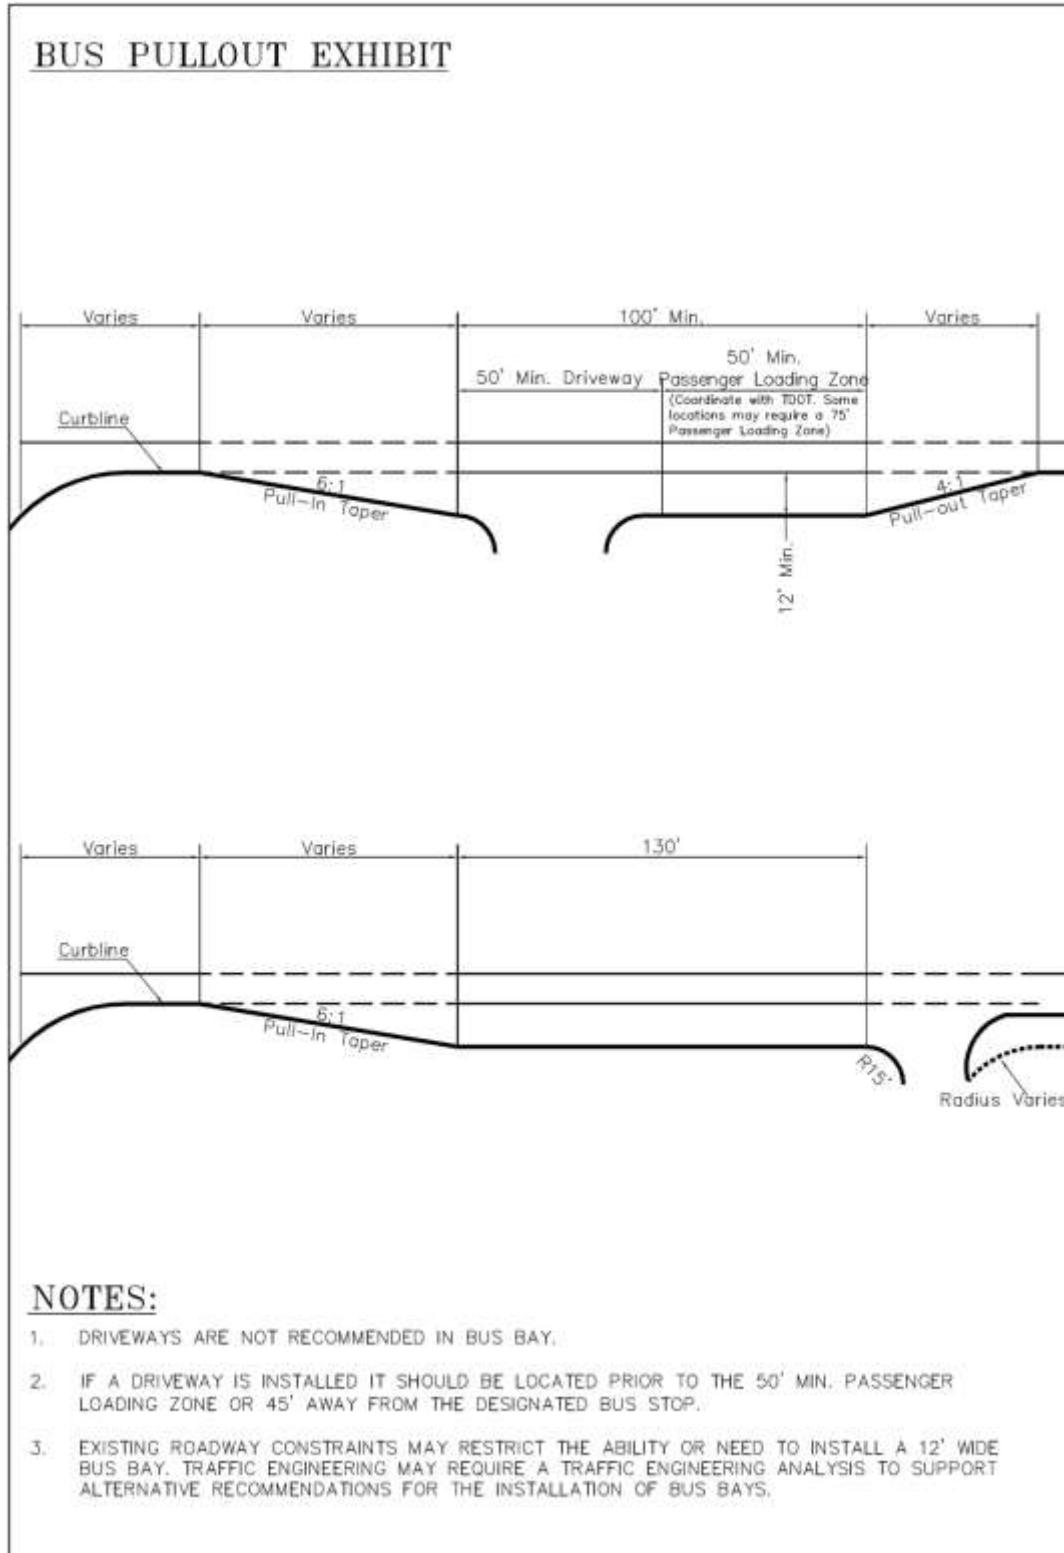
Bus Bay Detail 1 – Major Intersections
